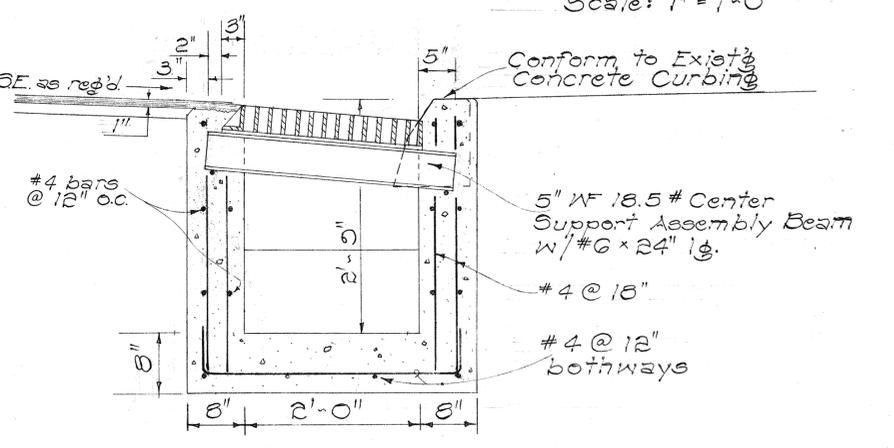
DETAIL OF TYPE "S" STEEL FRAME & GRATE
